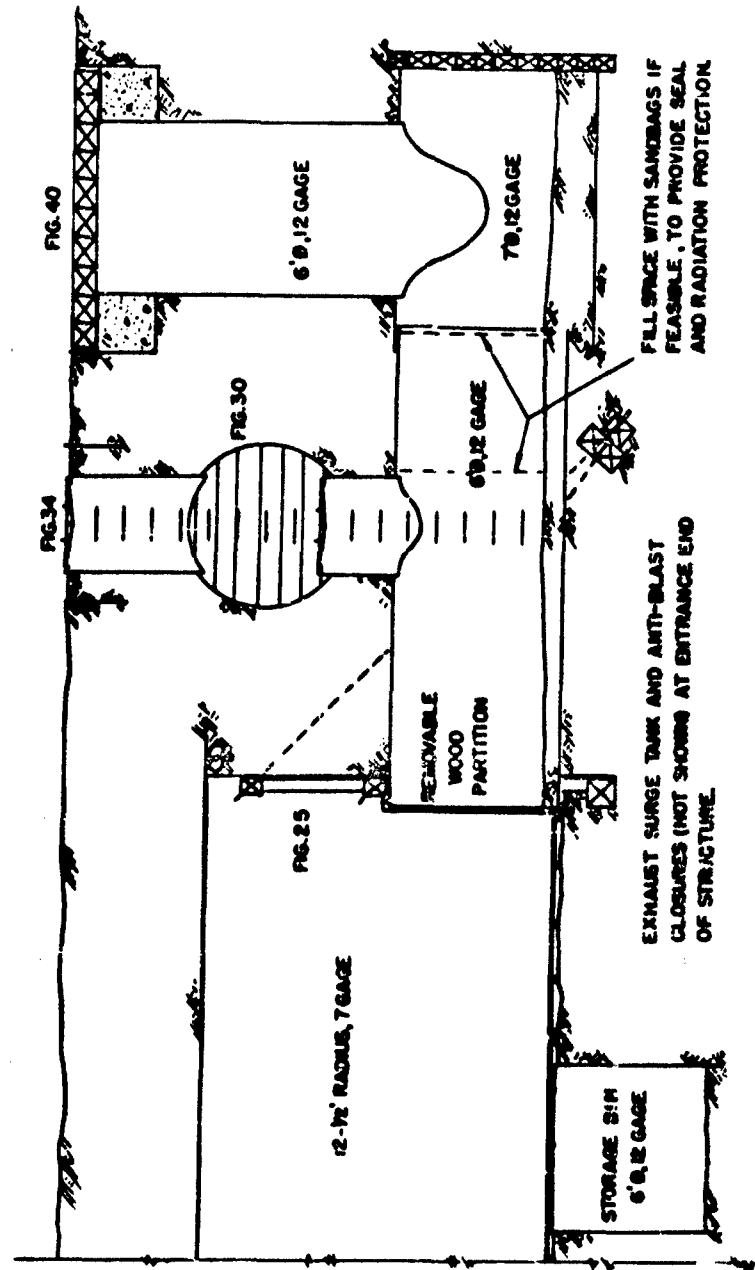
Example of continuous occupancy working station; vertical section of entrance configuration; section through centerline of each component structure.
